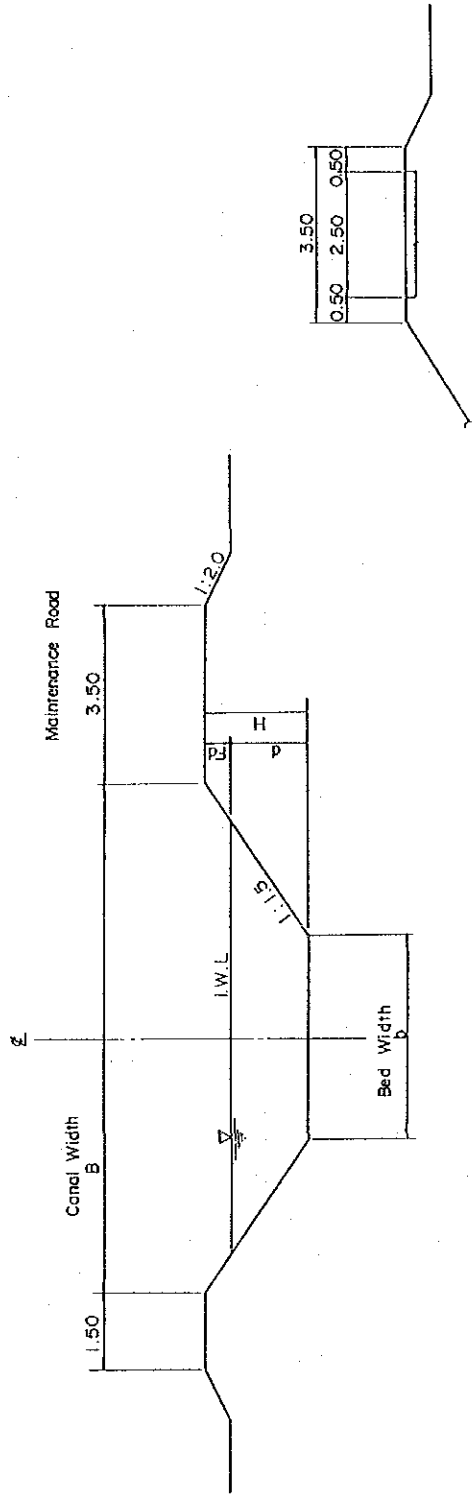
TYPICAL CROSS SECTION OF SECONDARY & SUB - SECONDARY CANAL
